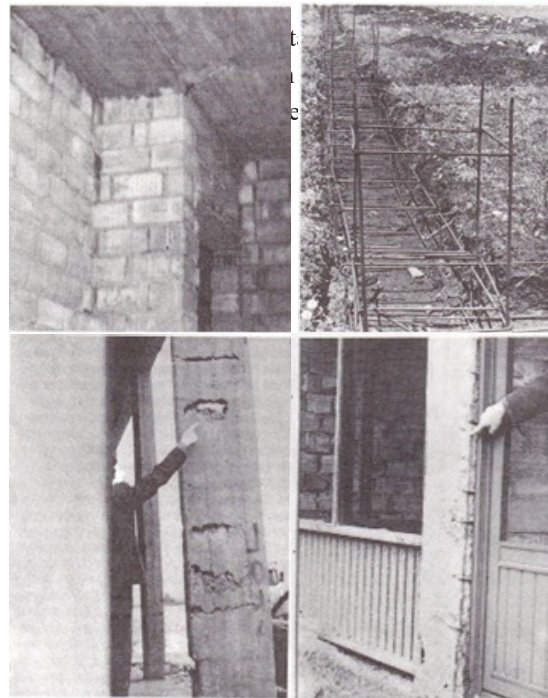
a – Wrong beam application at the masonry buildings, b – Erroneous foundation application, c – Cavities formed in the support element as a result of erroneous concreting and d – Column edge broken for iron door assembly (Kucuk,1989).
